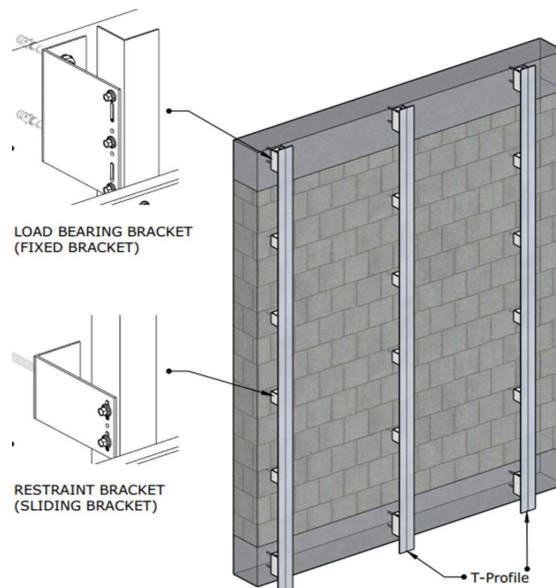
PRIMARY ALUMINIUM FRAMING
